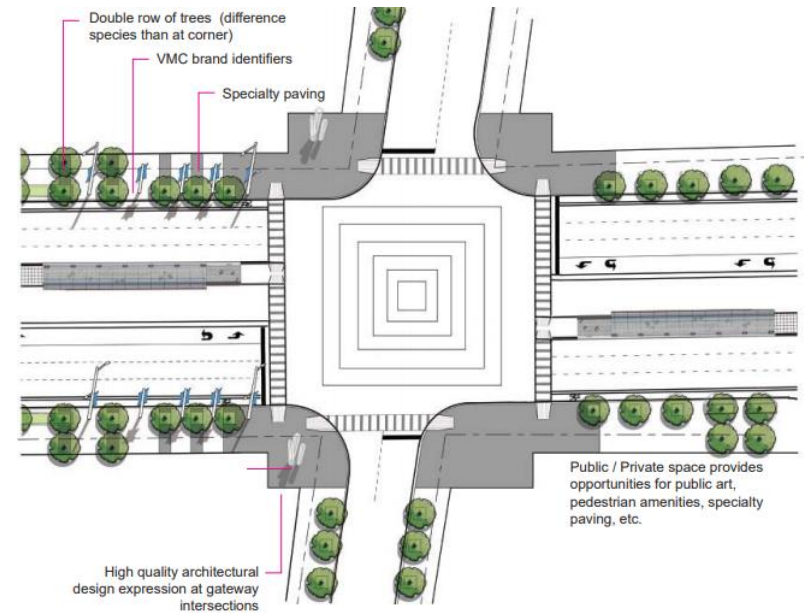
Demonstration Plan – Highway 7 and Creditstone Rd. (VMC Streetscape and Open Space Plan, 2018)
